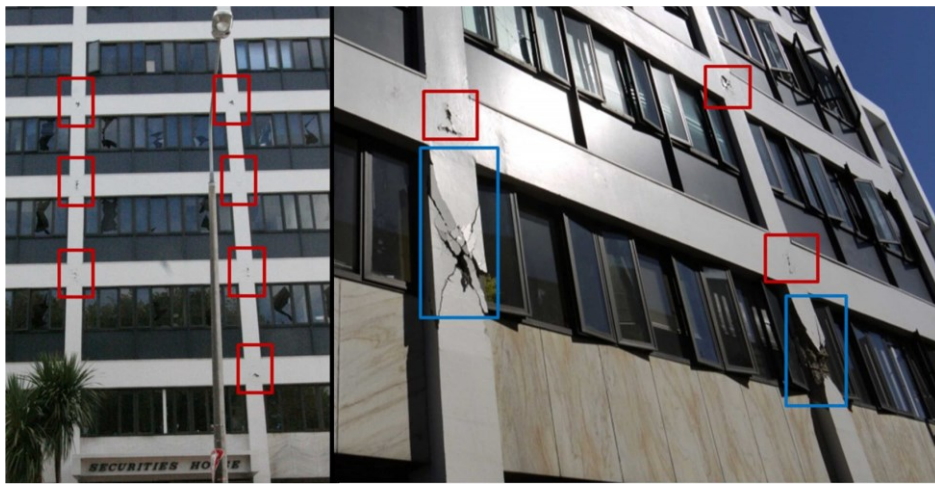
Building in Christchurch after 2011 earthquake, showing beam-column joints (red) and columns (blue) with reversed cyclic damage (Ruggiero, 2015).
